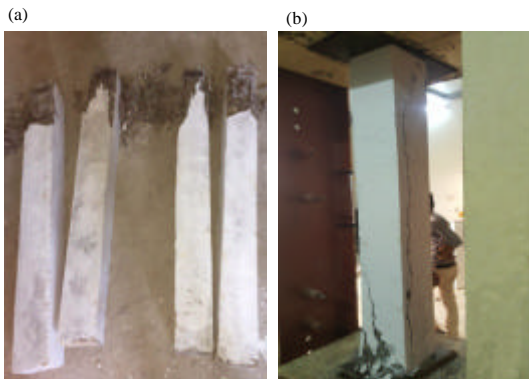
Concrete columns after failure; a) Columns CS1-CS4 and b) Column CS1
